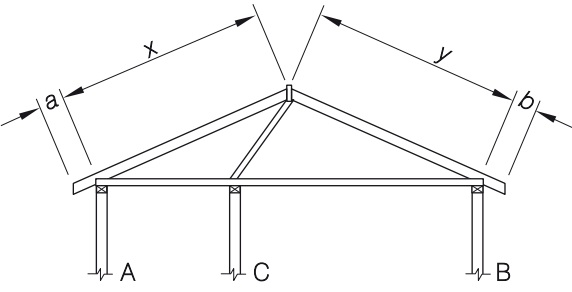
CEILING LOAD WIDTH (CLW)
